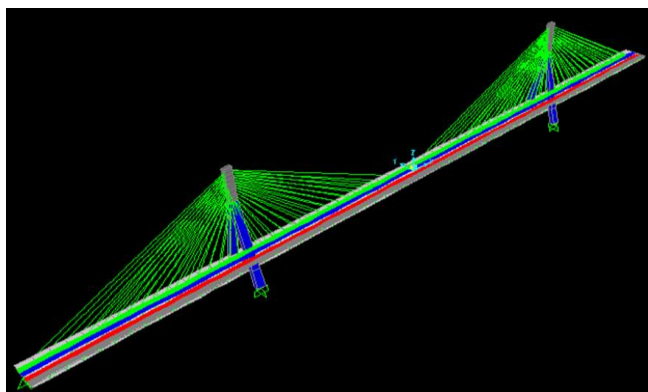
3D Picture of 320 m Cable Stayed Bridge with four lane road
